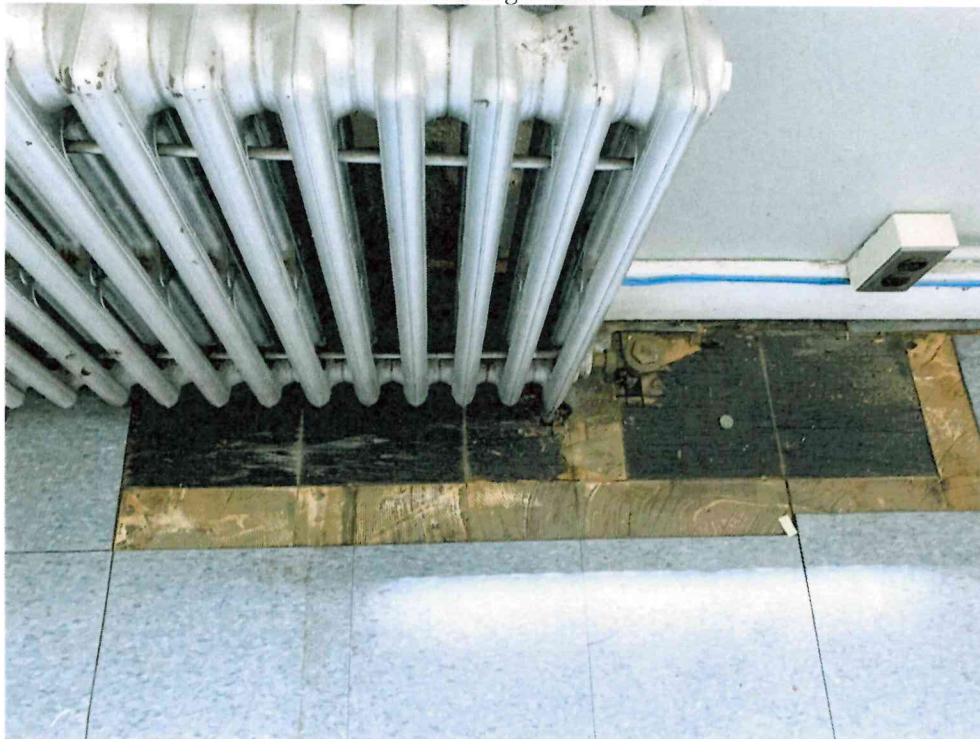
1st Floor Room 3 (southeast) – Typical layered flooring shown. Non-ACM floor tile located over 9”x9” flooring and black mastic identified as ACM.
